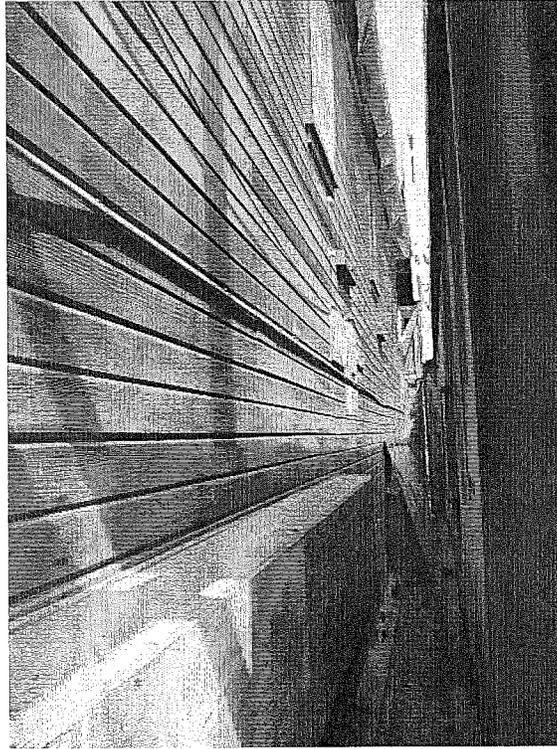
122 Main Street, Side (east) elevation, view to north (PCR 2012)
